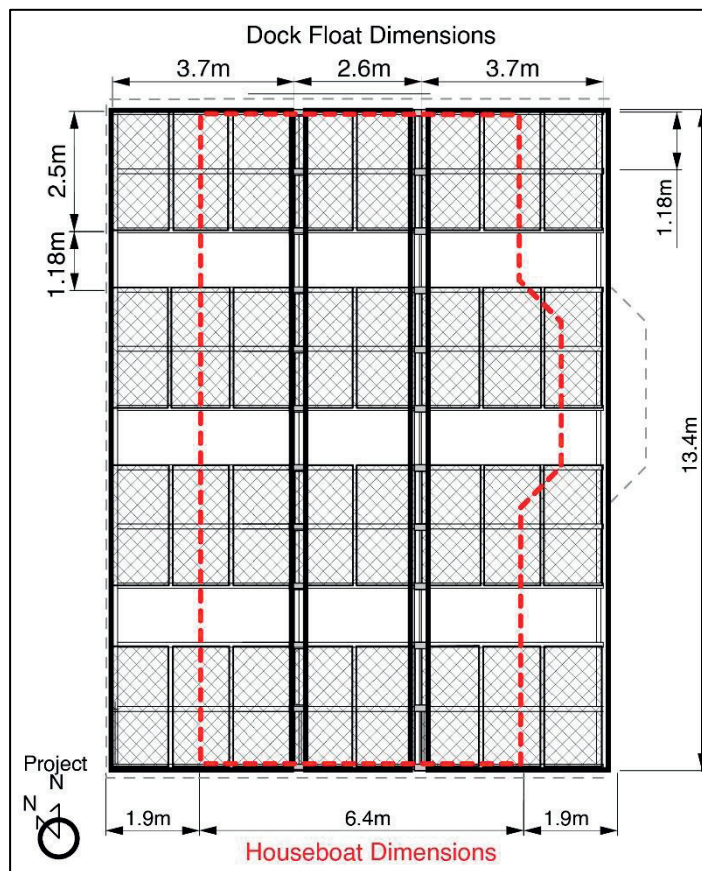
Floating foundation framing plan (Note: Framing plan draws from NRC Floating Pavilion preliminary construction drawings, courtesy of the Buoyant Foundation Project [8])
